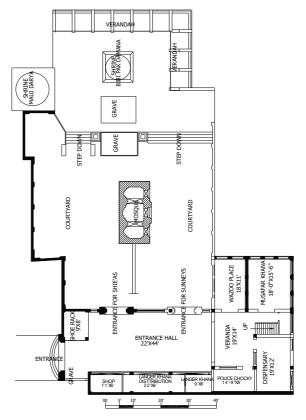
Layout Plan of Shrine Hazrat Bibi Pak Damanan at Lahore
